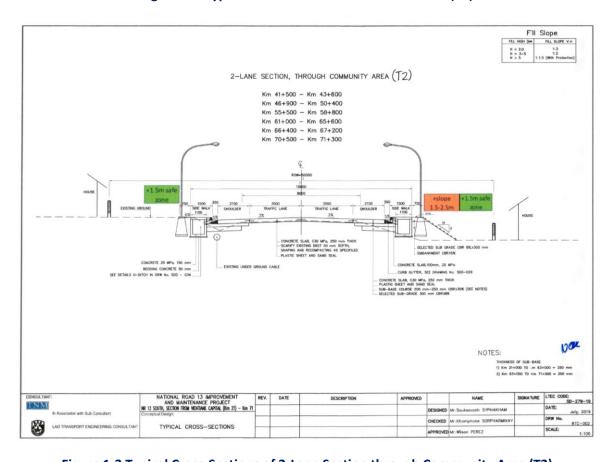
Typical Cross-Sections of 2-Lane Section through Community Area (T2)
